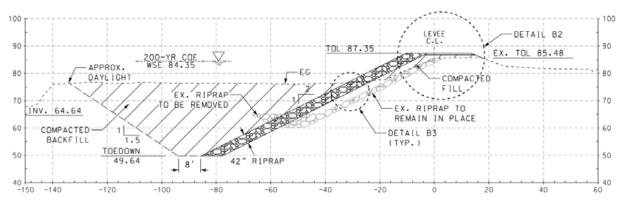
Typical Cross Section of Alternative 2, Loose Riprap for 200-Year Flow (Sta. 270+00)
